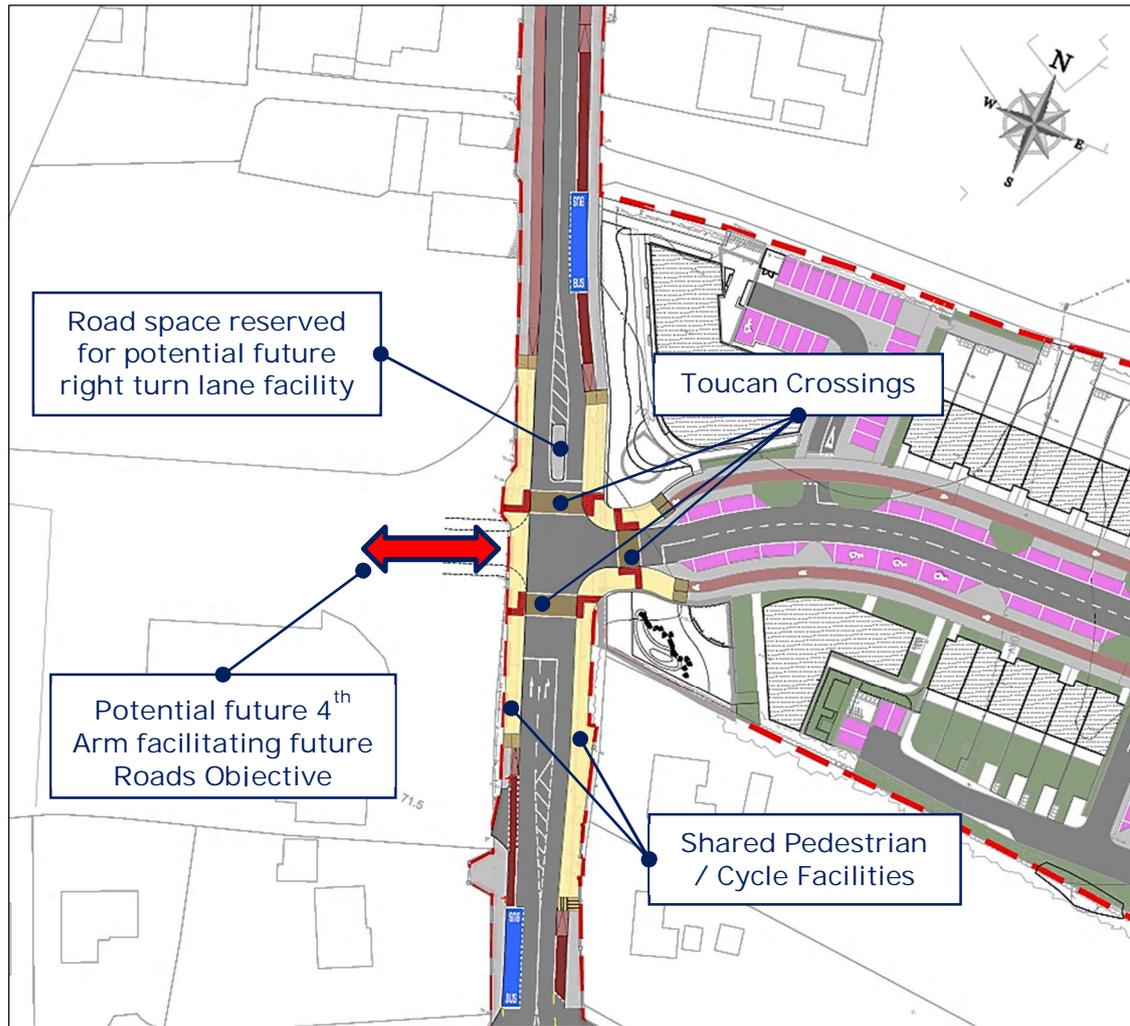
Proposed Site Access on R443 Clonminch Rd
